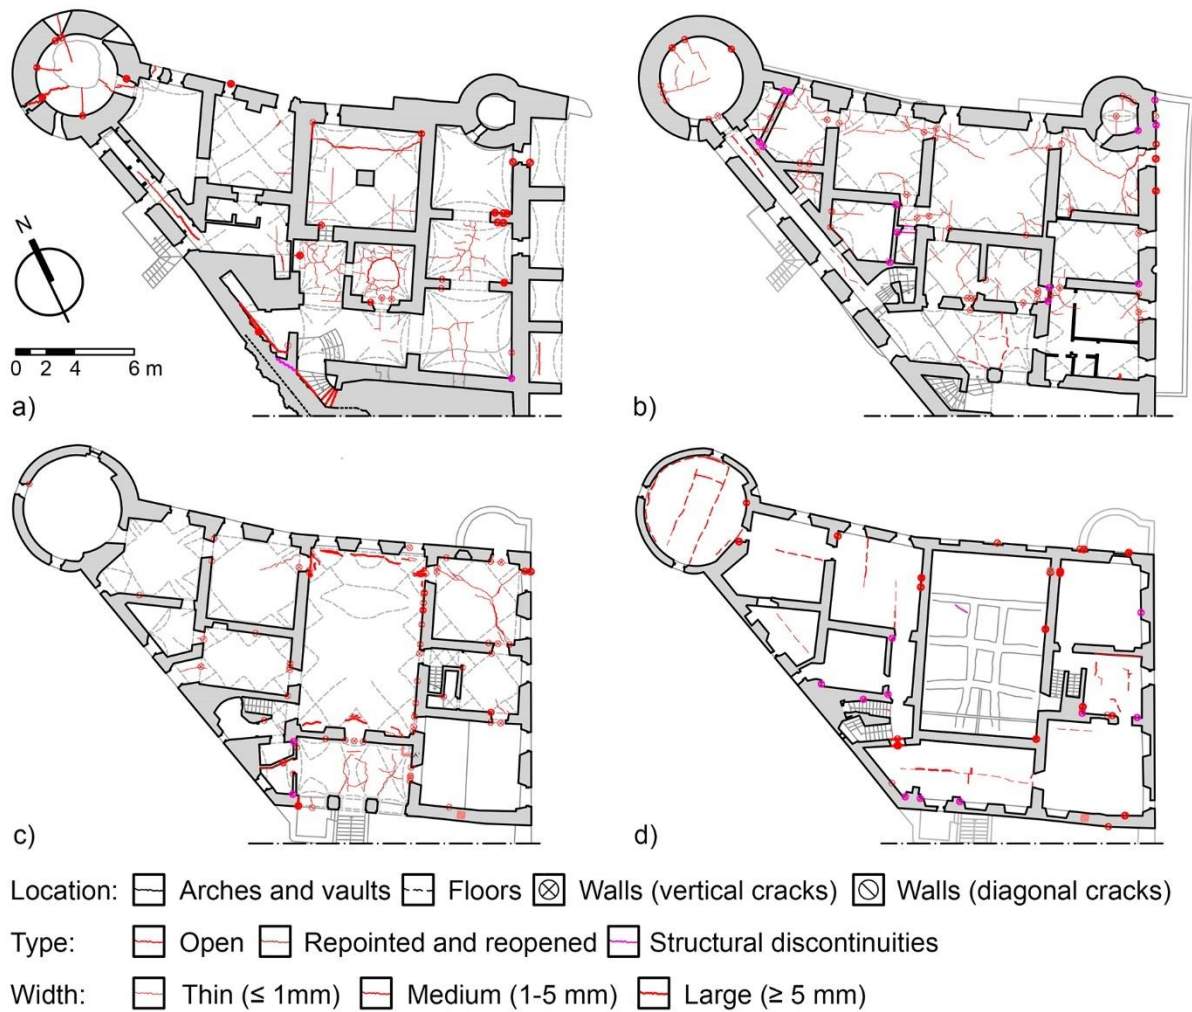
Crack patterns survey: a) ground floor; b) first floor; c) second floor; d) attic.
